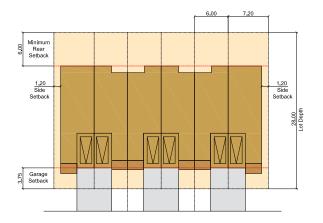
Front Drive Townhouse Products, Shallow and Standard
